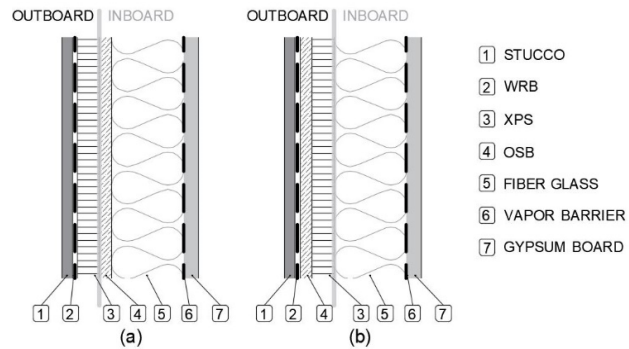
Assembly 1 (a) and Assembly 2 (b)
